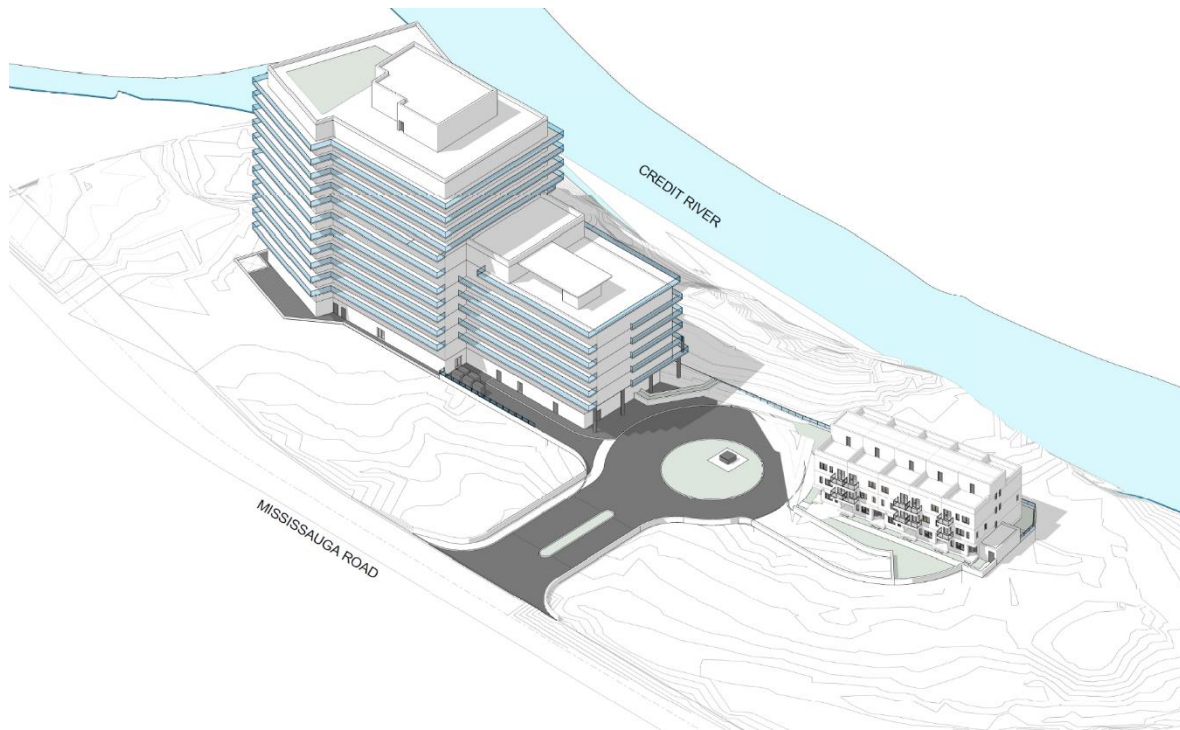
3D site overview looking northwest (Caricari Lee Architects, 2026)
